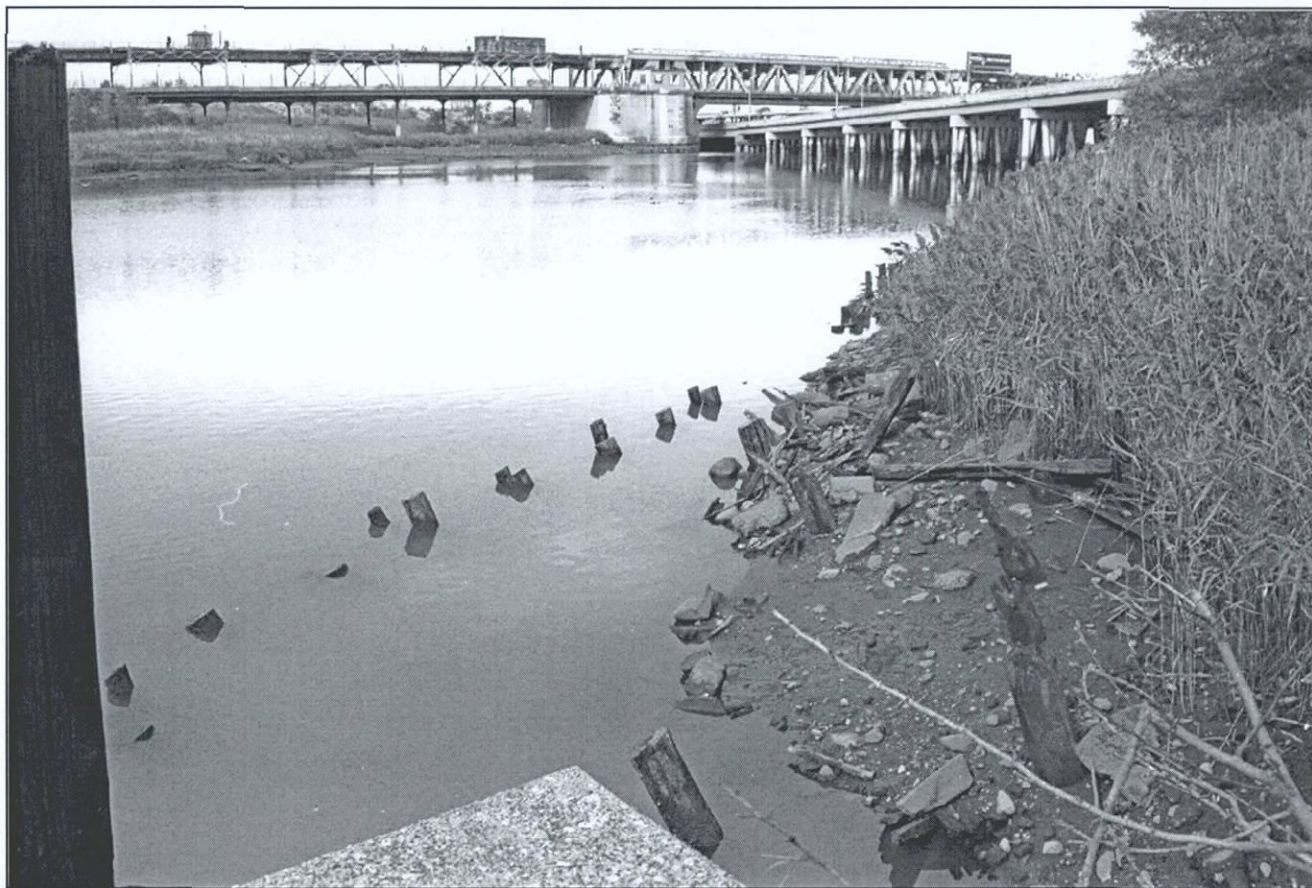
Pilings north of NYSDEC outfall, east bank of Flushing Creek, facing northwest. Flushing Bay Ecosystem Restoration Project, Queens County, New York (Pickman 2002).
